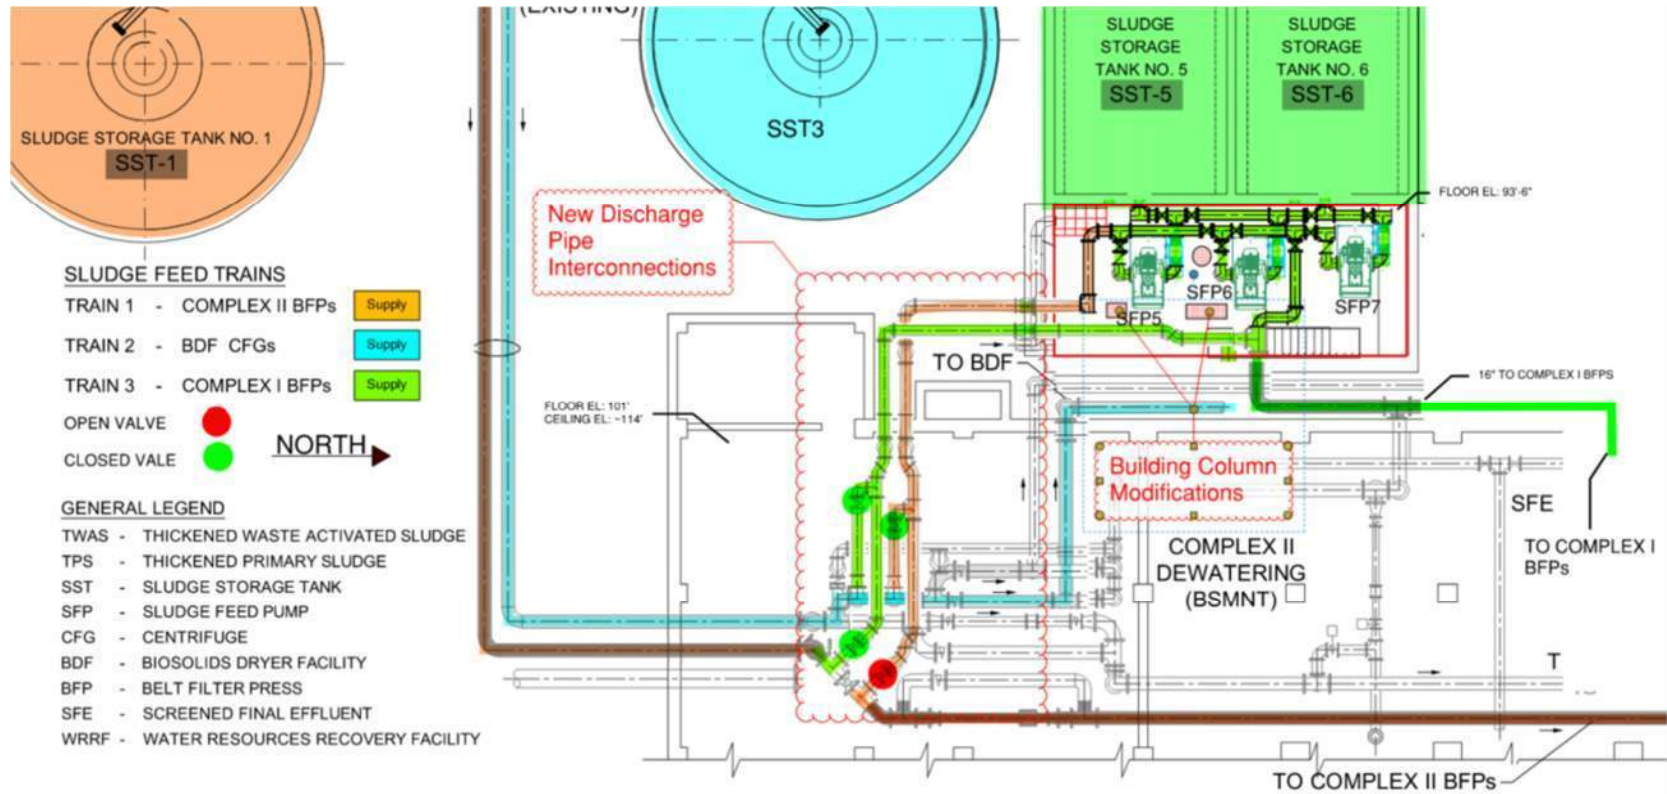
Alt-1 SSTs 5/6 Pump Building Layout
